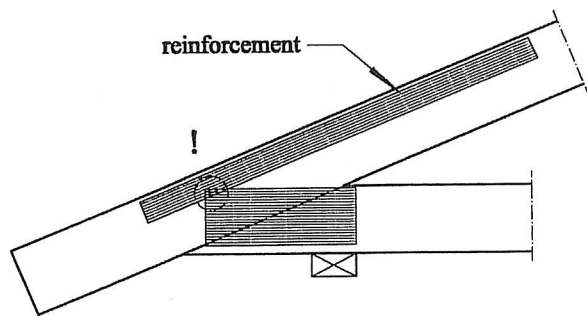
A reinforcement plate in conflict with a beam connecting plate.
